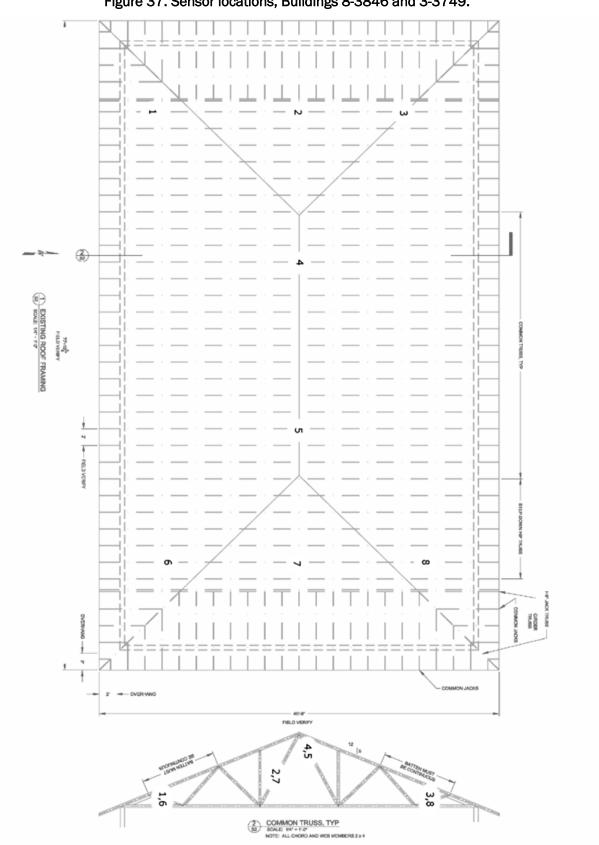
Sensor locations, Buildings 8-3846 and 3-3749.
